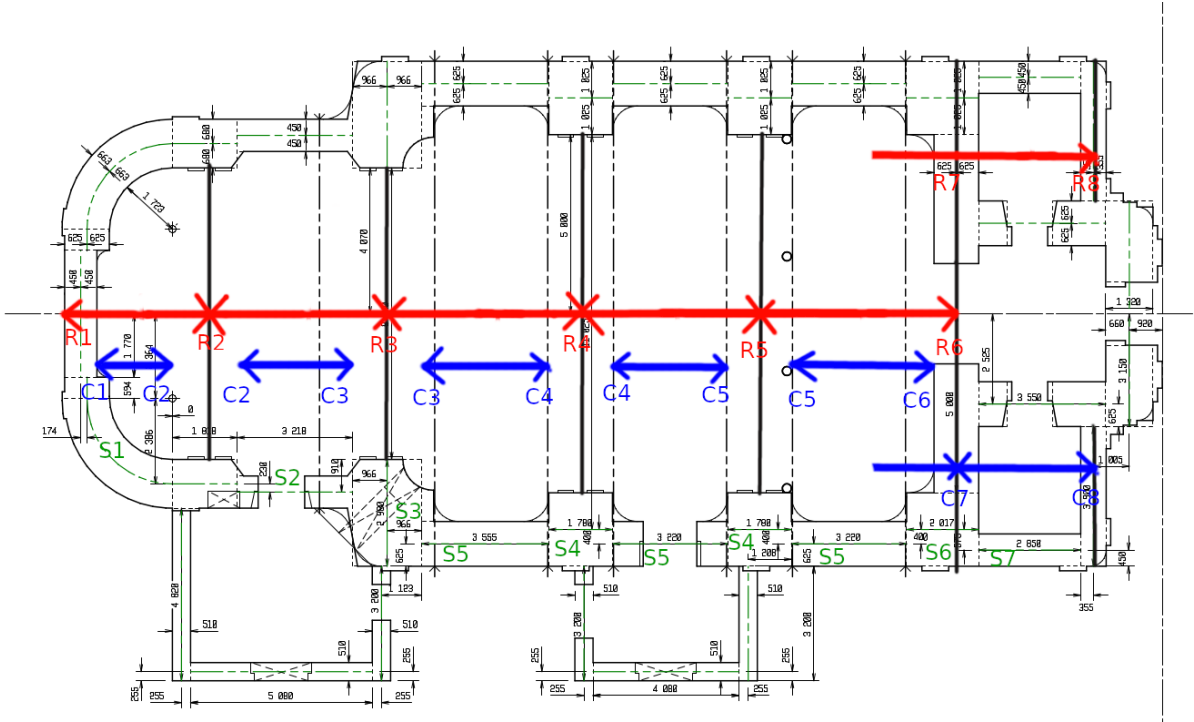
Roof and ceiling load scheme. R1 through R8 are considered as roof load paths. C1 through C8 are considered for the ceiling. S1 through S7 are direct loads bearing on the walls, both roof and ceiling load.
